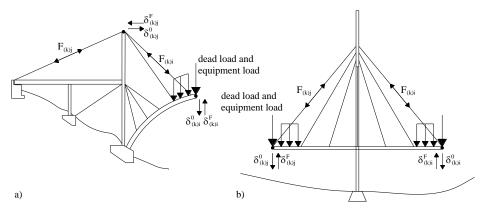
Partial elastic scheme with kinematic constraints: a) arch bridge, b) cable-stayed bridge
